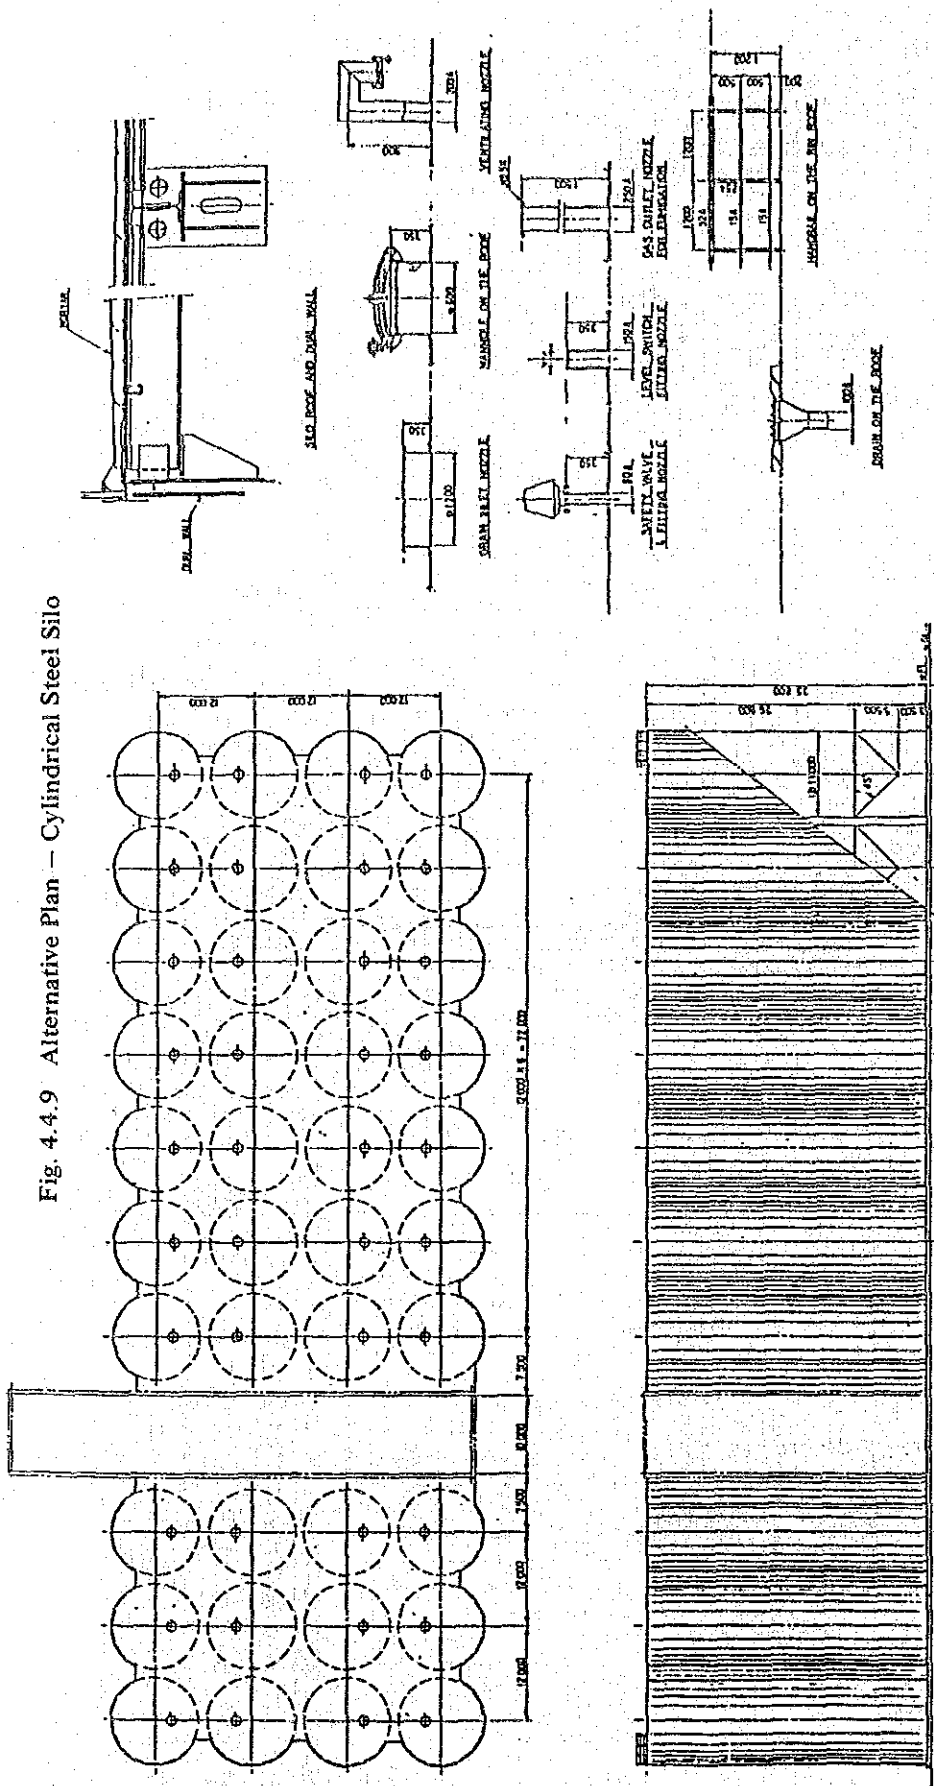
Alternative Plan - Cylindrical Steel Silo
